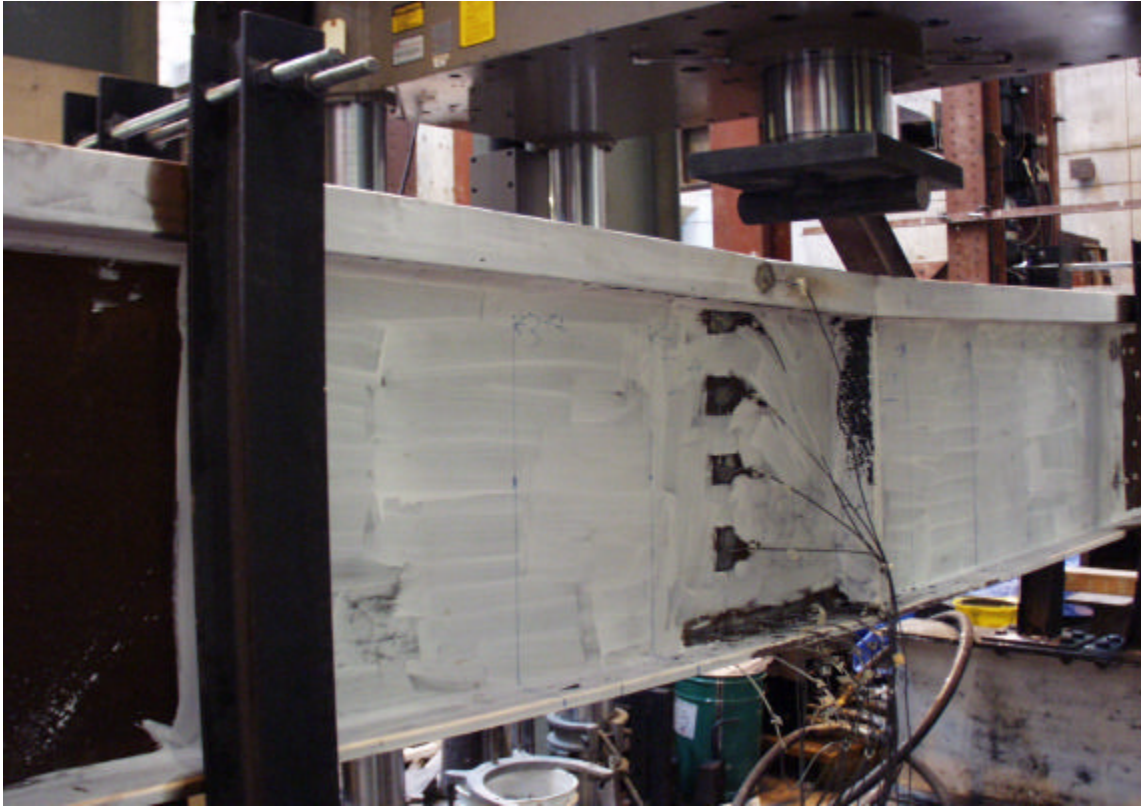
View of girder specimen after testing showing permanent plastic rotation
